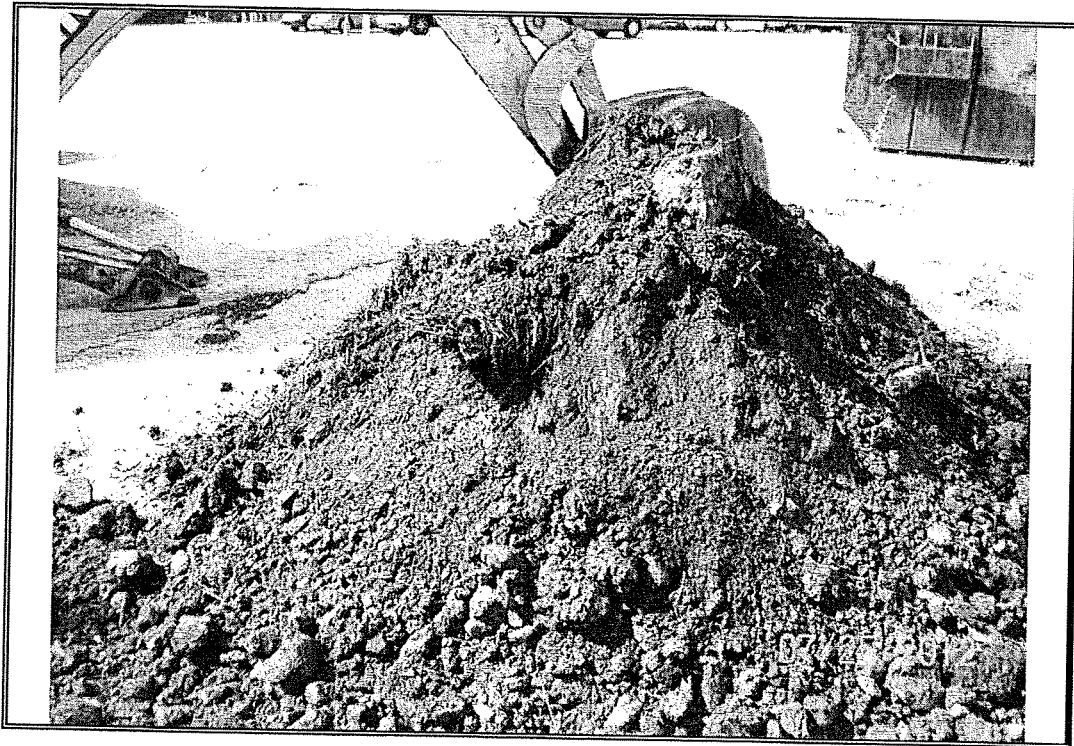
View of stockpiled soils/debris excavated from TP-2.
